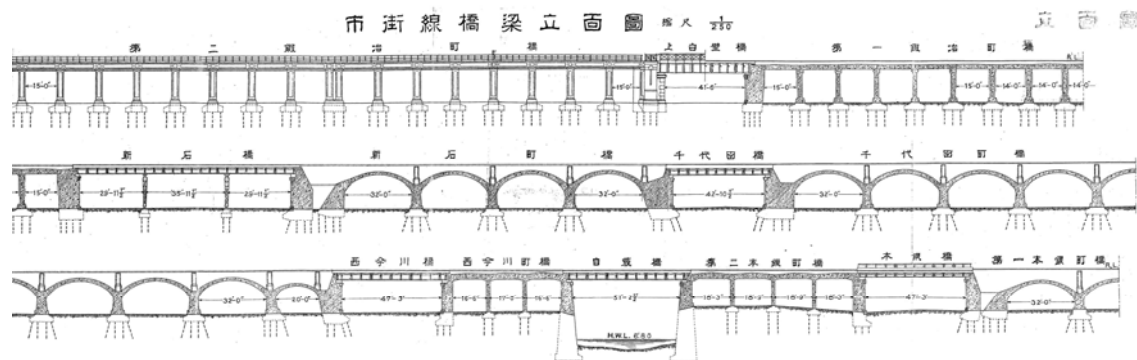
structural elevations of the elevated railway, (Construction Bulletin for In-city Elevated Railway between Tokyo and Manseibashi Station, 1920)
